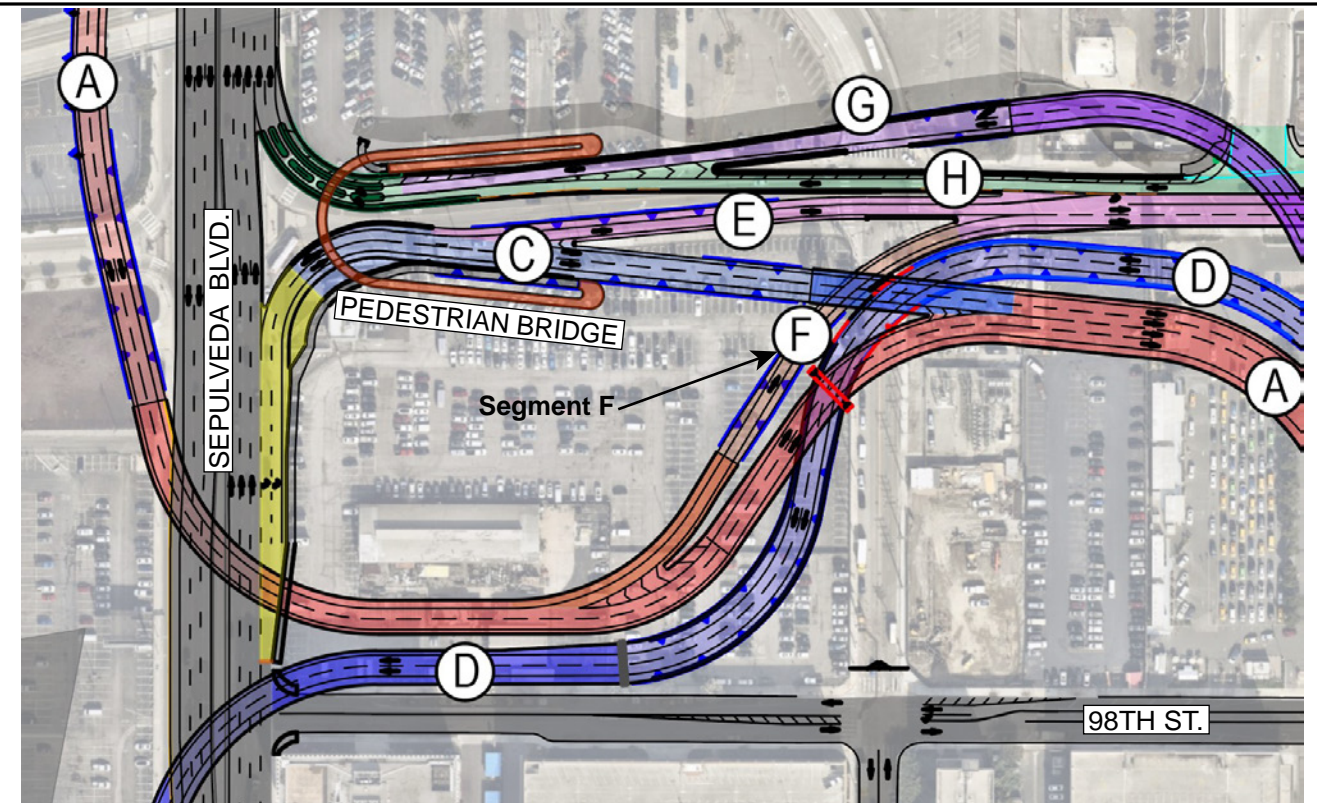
The eastern portion of Segment F would be relocated/reconfigured to be an offramp from Segment A and connect to EB 96th Street. With Segment A being elevated above Sepulveda Boulevard, this would enable movement from Sepulveda Boulevard southbound to 96th Street eastbound to occur without the need to install a traffic signal at Sepulveda Boulevard and 96th Street.
